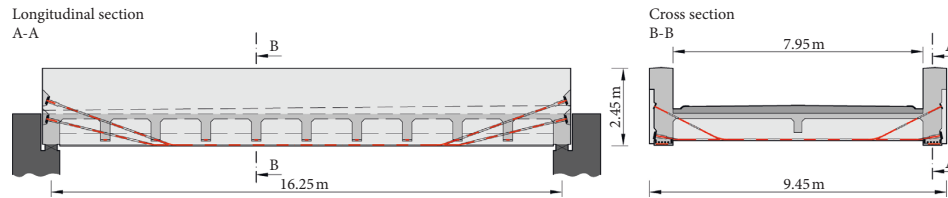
Cable arrangement in the longitudinal and transverse directions for strengthening of a U-shaped bridge with straight girders, built in Třebechovice in 1932, according to project documentation [21].
